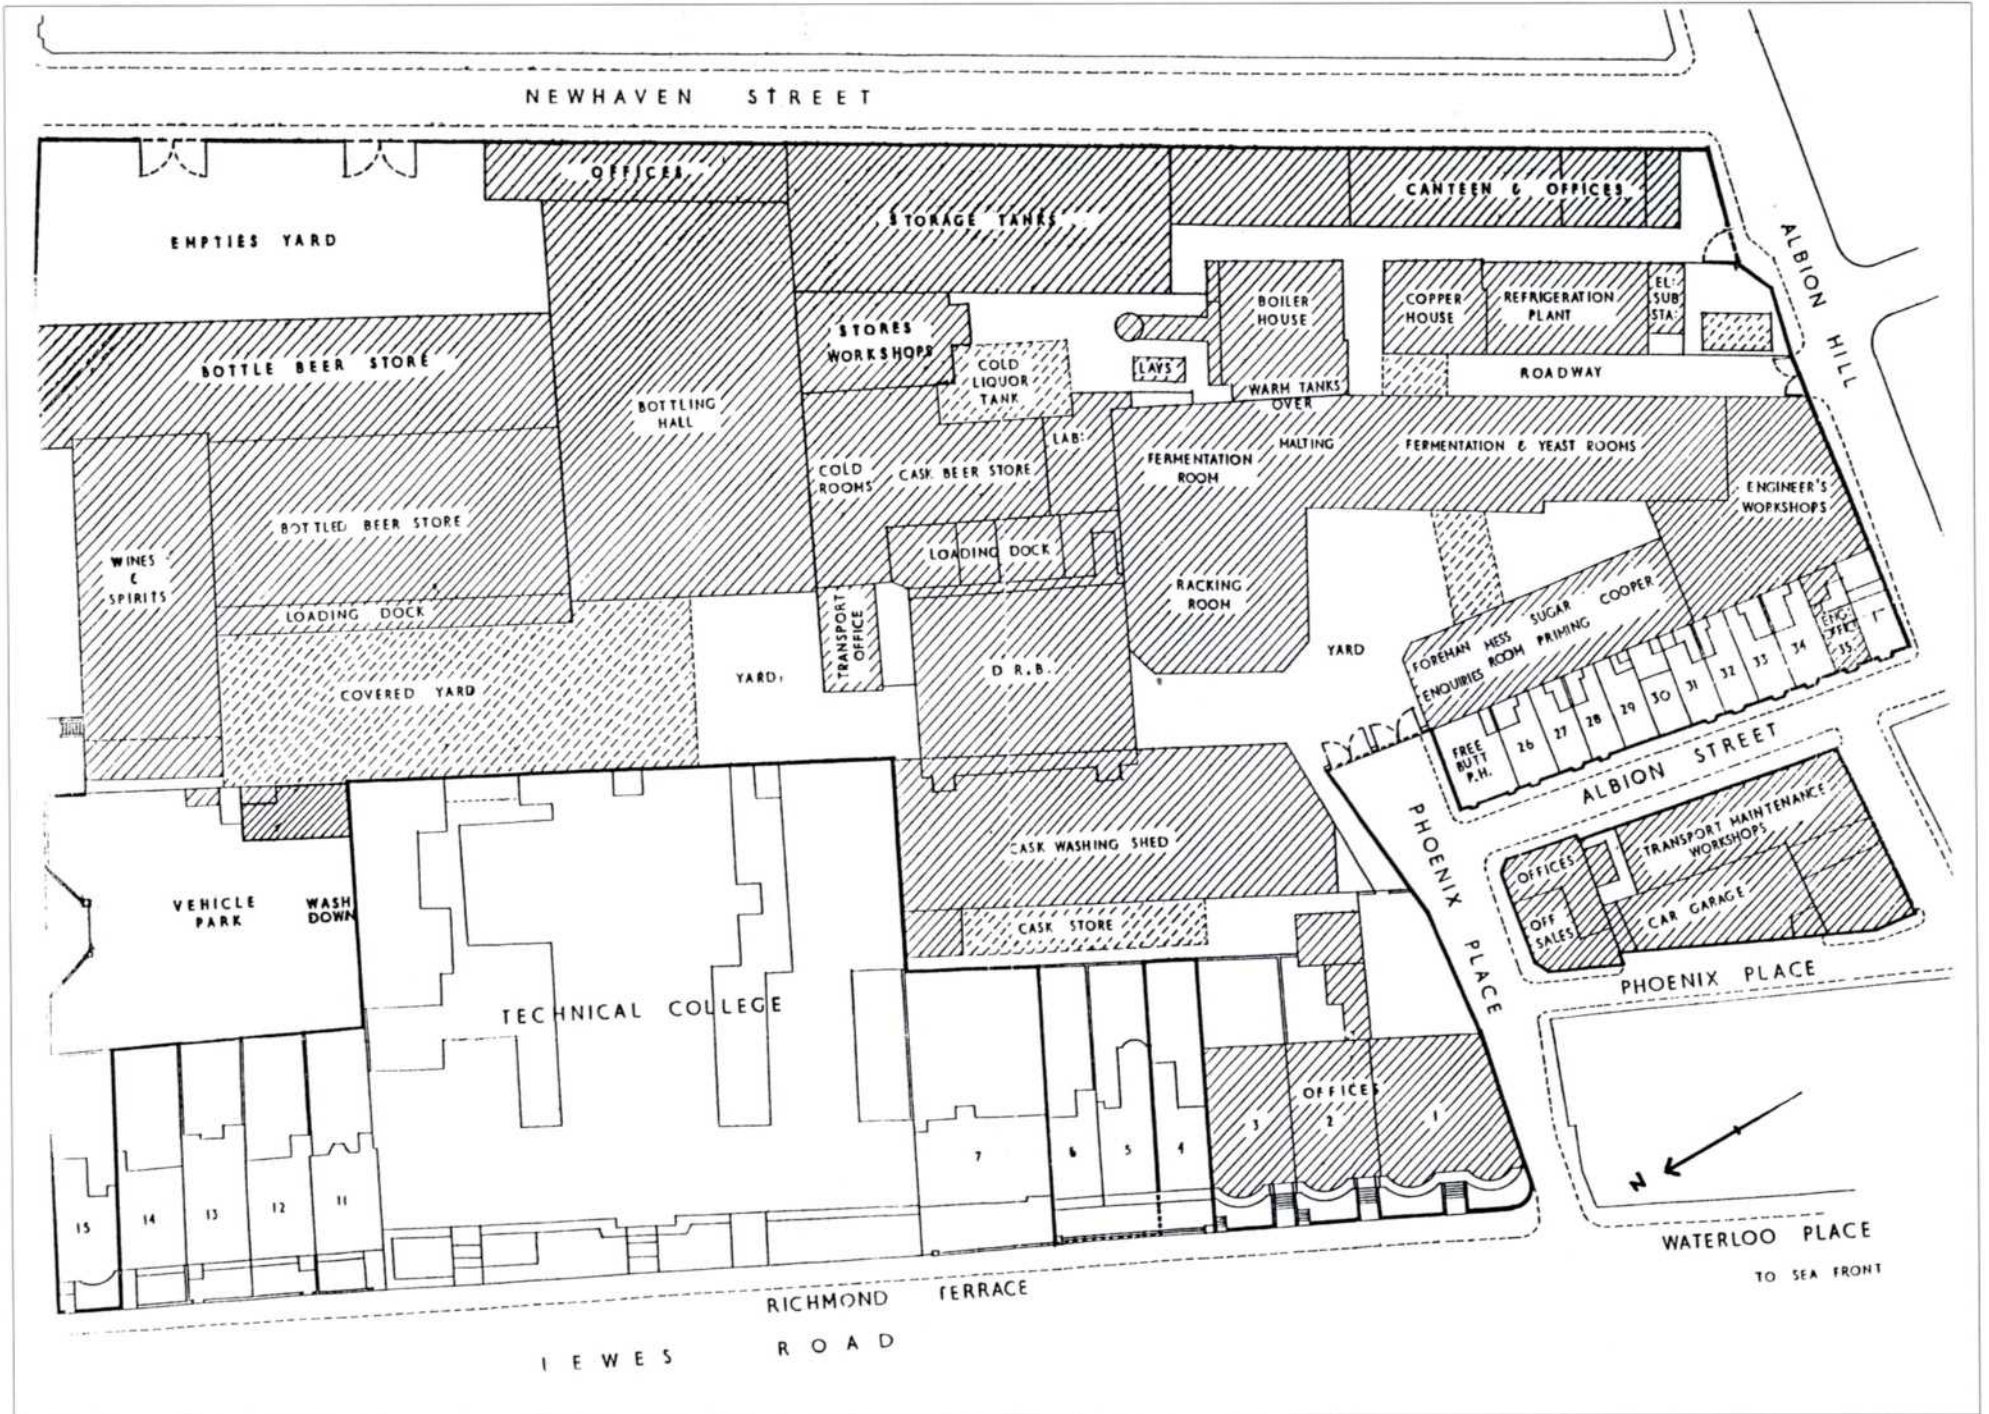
Site Plan of Brewery Buildings in the 1970s
